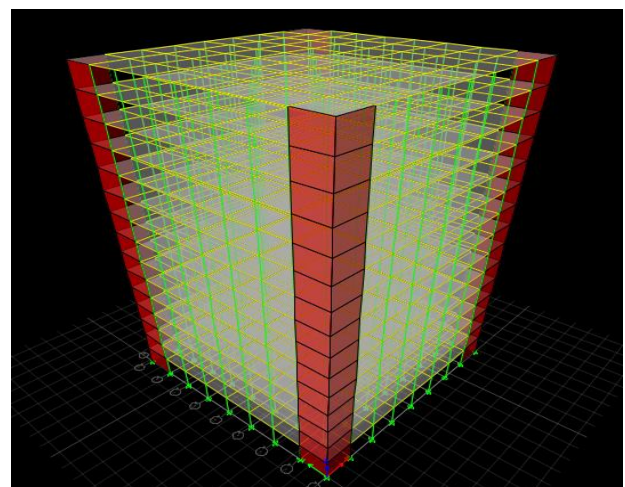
3D view of model with Shear Wall Position-1 (SWP-1)
